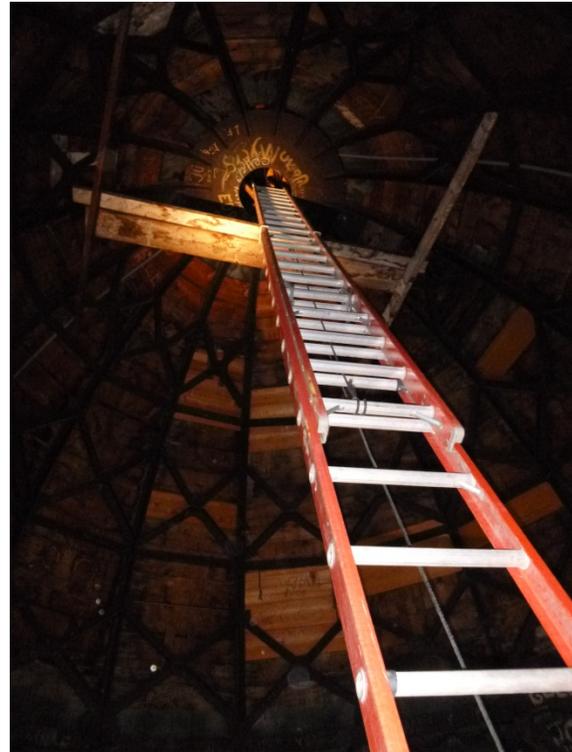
A 40-foot extension ladder was used to access the lantern interior.
